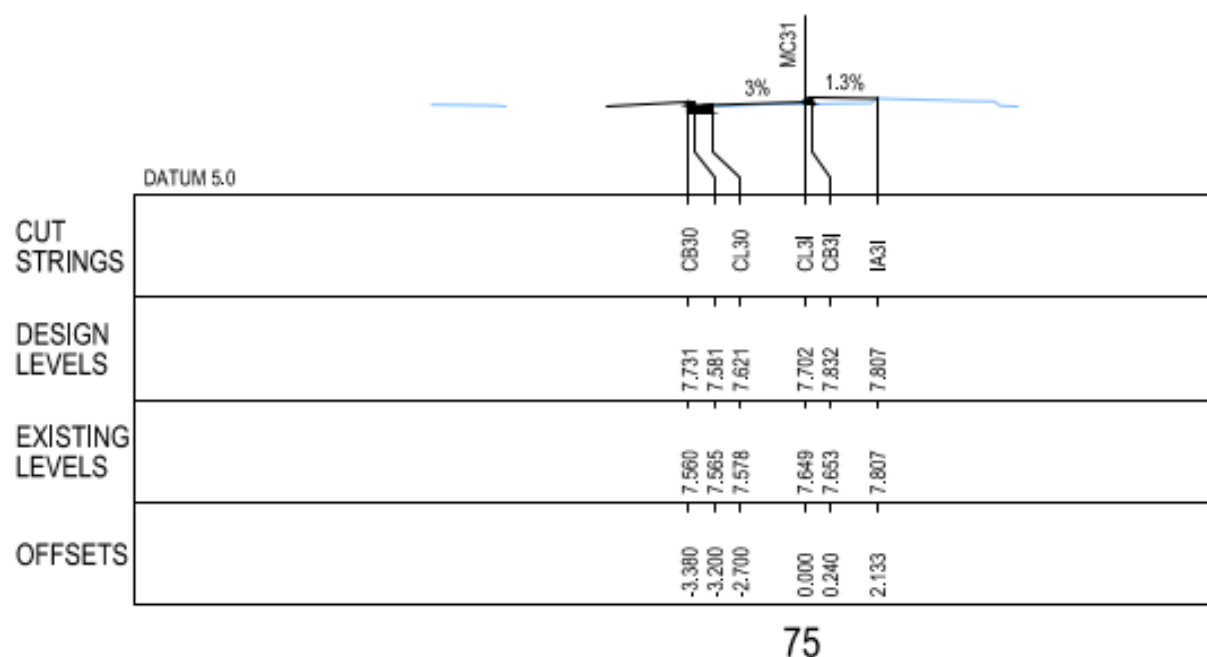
Existing and proposed road cross section at Sydney Park Road sag (Munni Street branch crossing)
